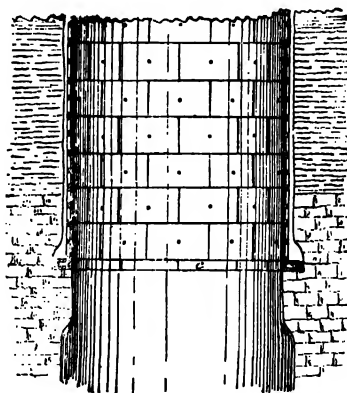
Shaft tubbed with Cast-iron Tubbing
